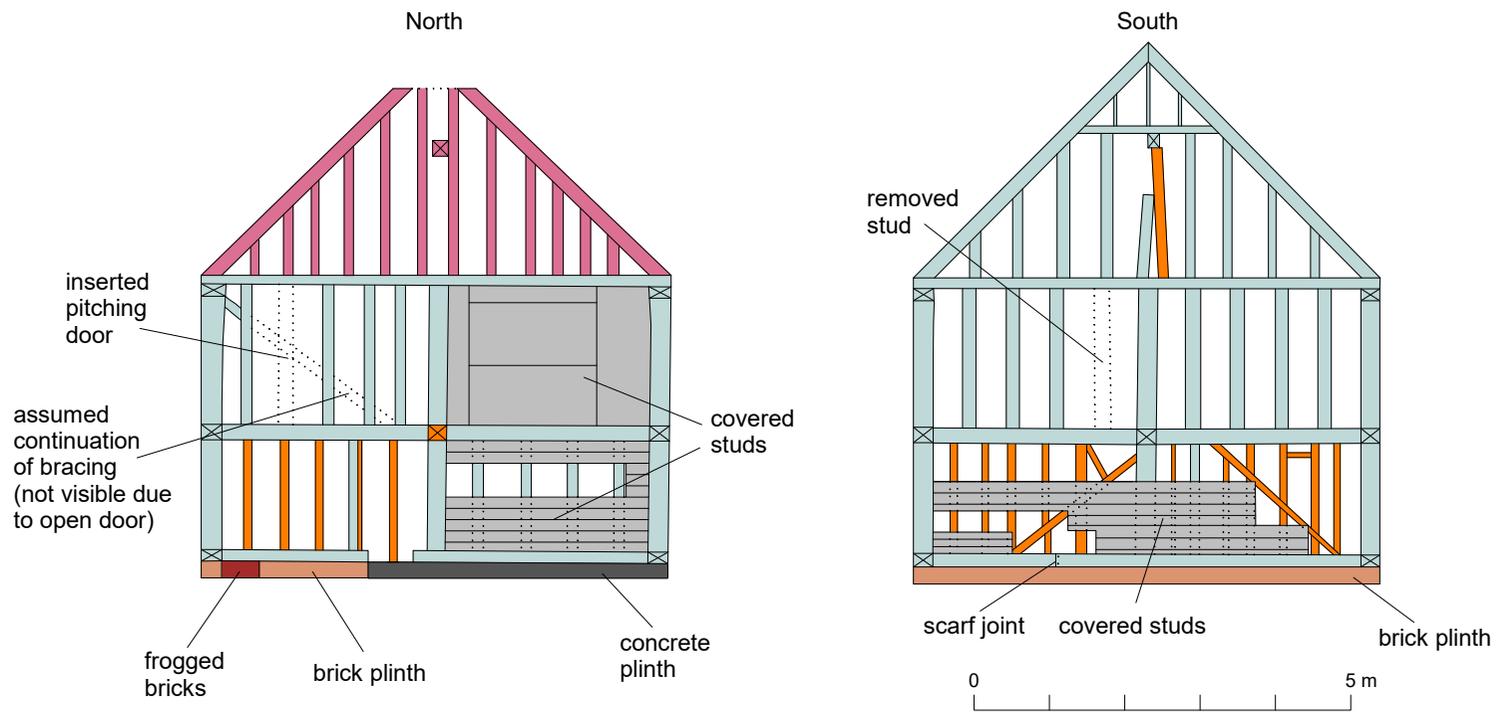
Frame drawing of the north and south walls of the barn, indicating the locations of original, re-used and replacement timbers.
